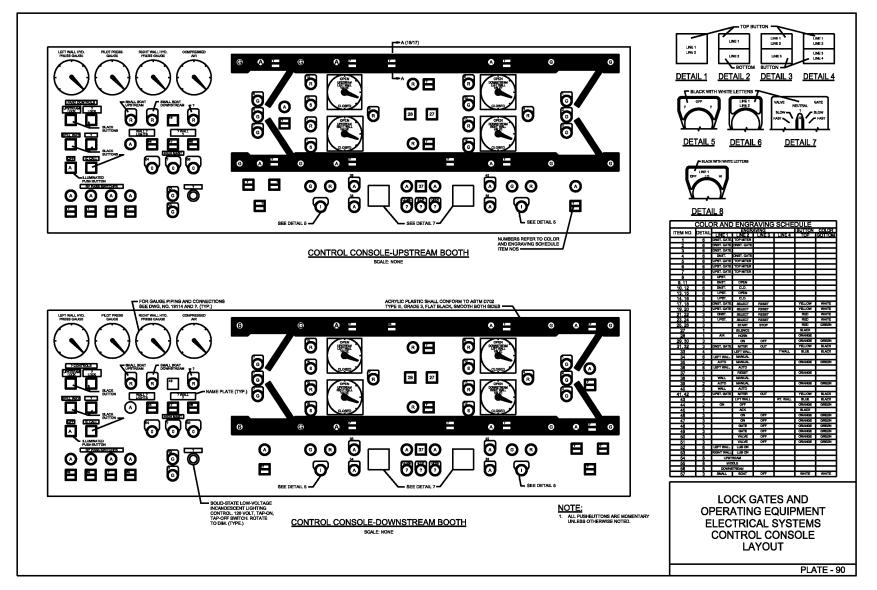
Plate 90: Lock gates and operating equipment, electrical systems, control console layout
